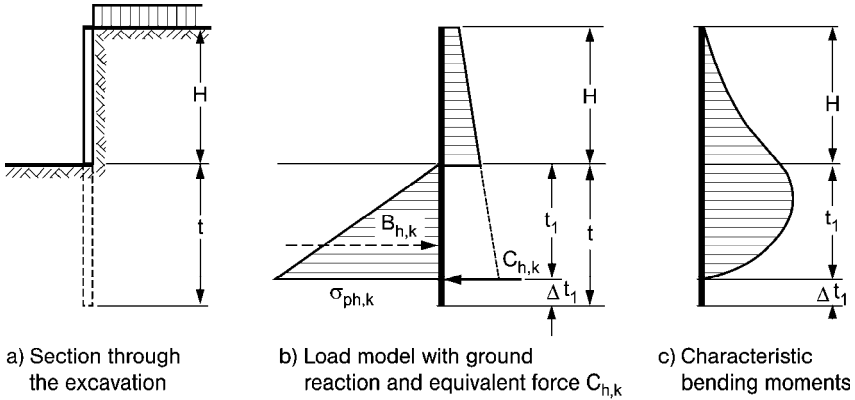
System, loading and moment distribution for an unsupported soldier pile wall with fixed earth support
